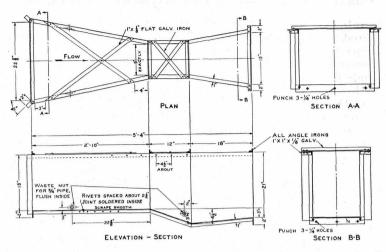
Plan and elevation of a 9-inch sheet-metal Parshall measuring flume.
